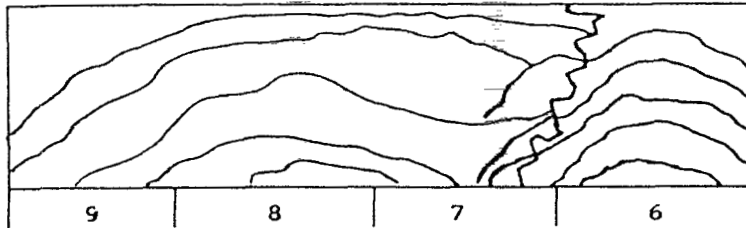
Cracks in concrete floor in front of the storage rooms
